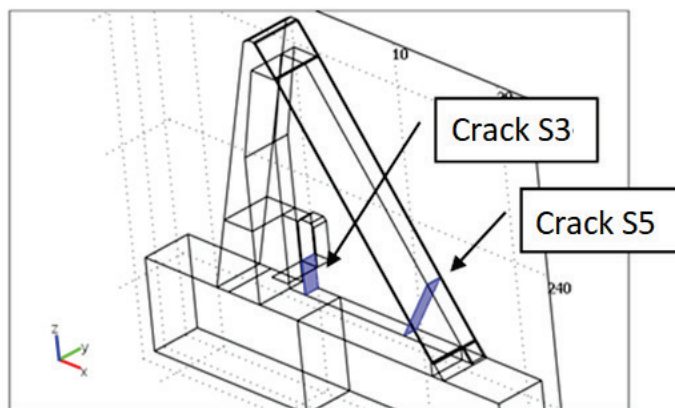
Cracks S3 and S5 In pier 1.
